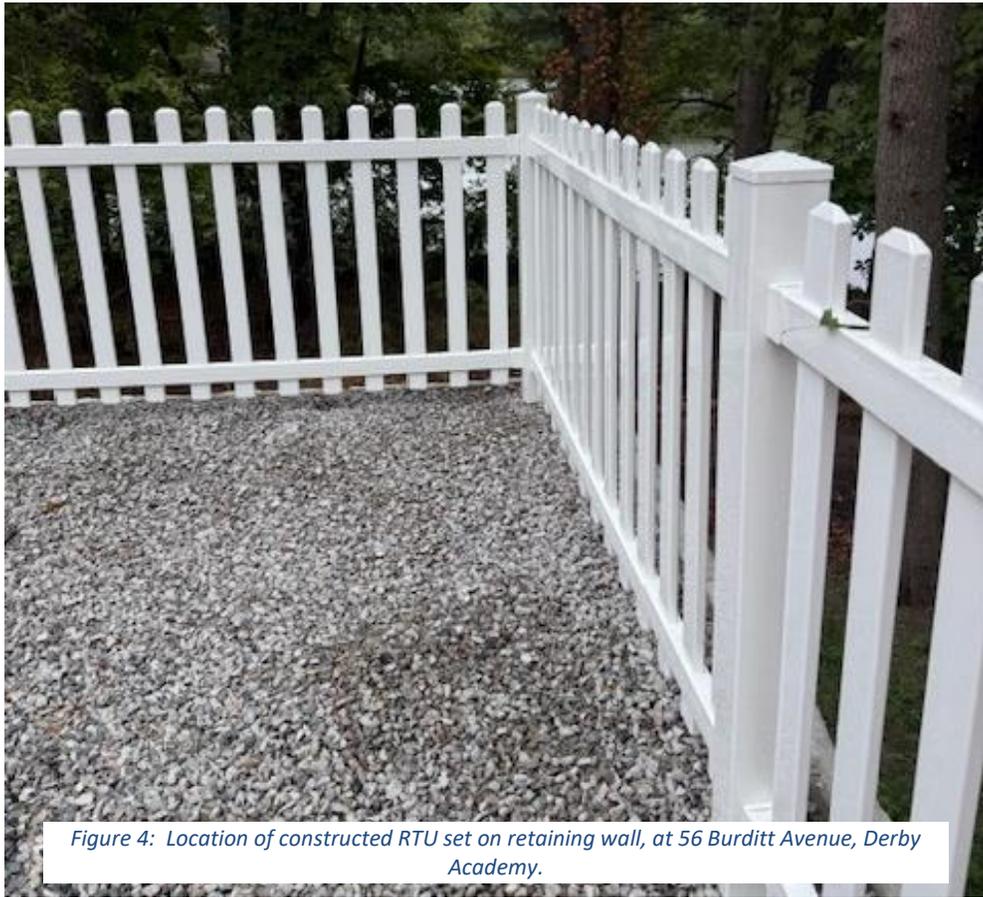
Location of constructed RTU set on retaining wall, at 56 Burditt Avenue, Derby Academy.
